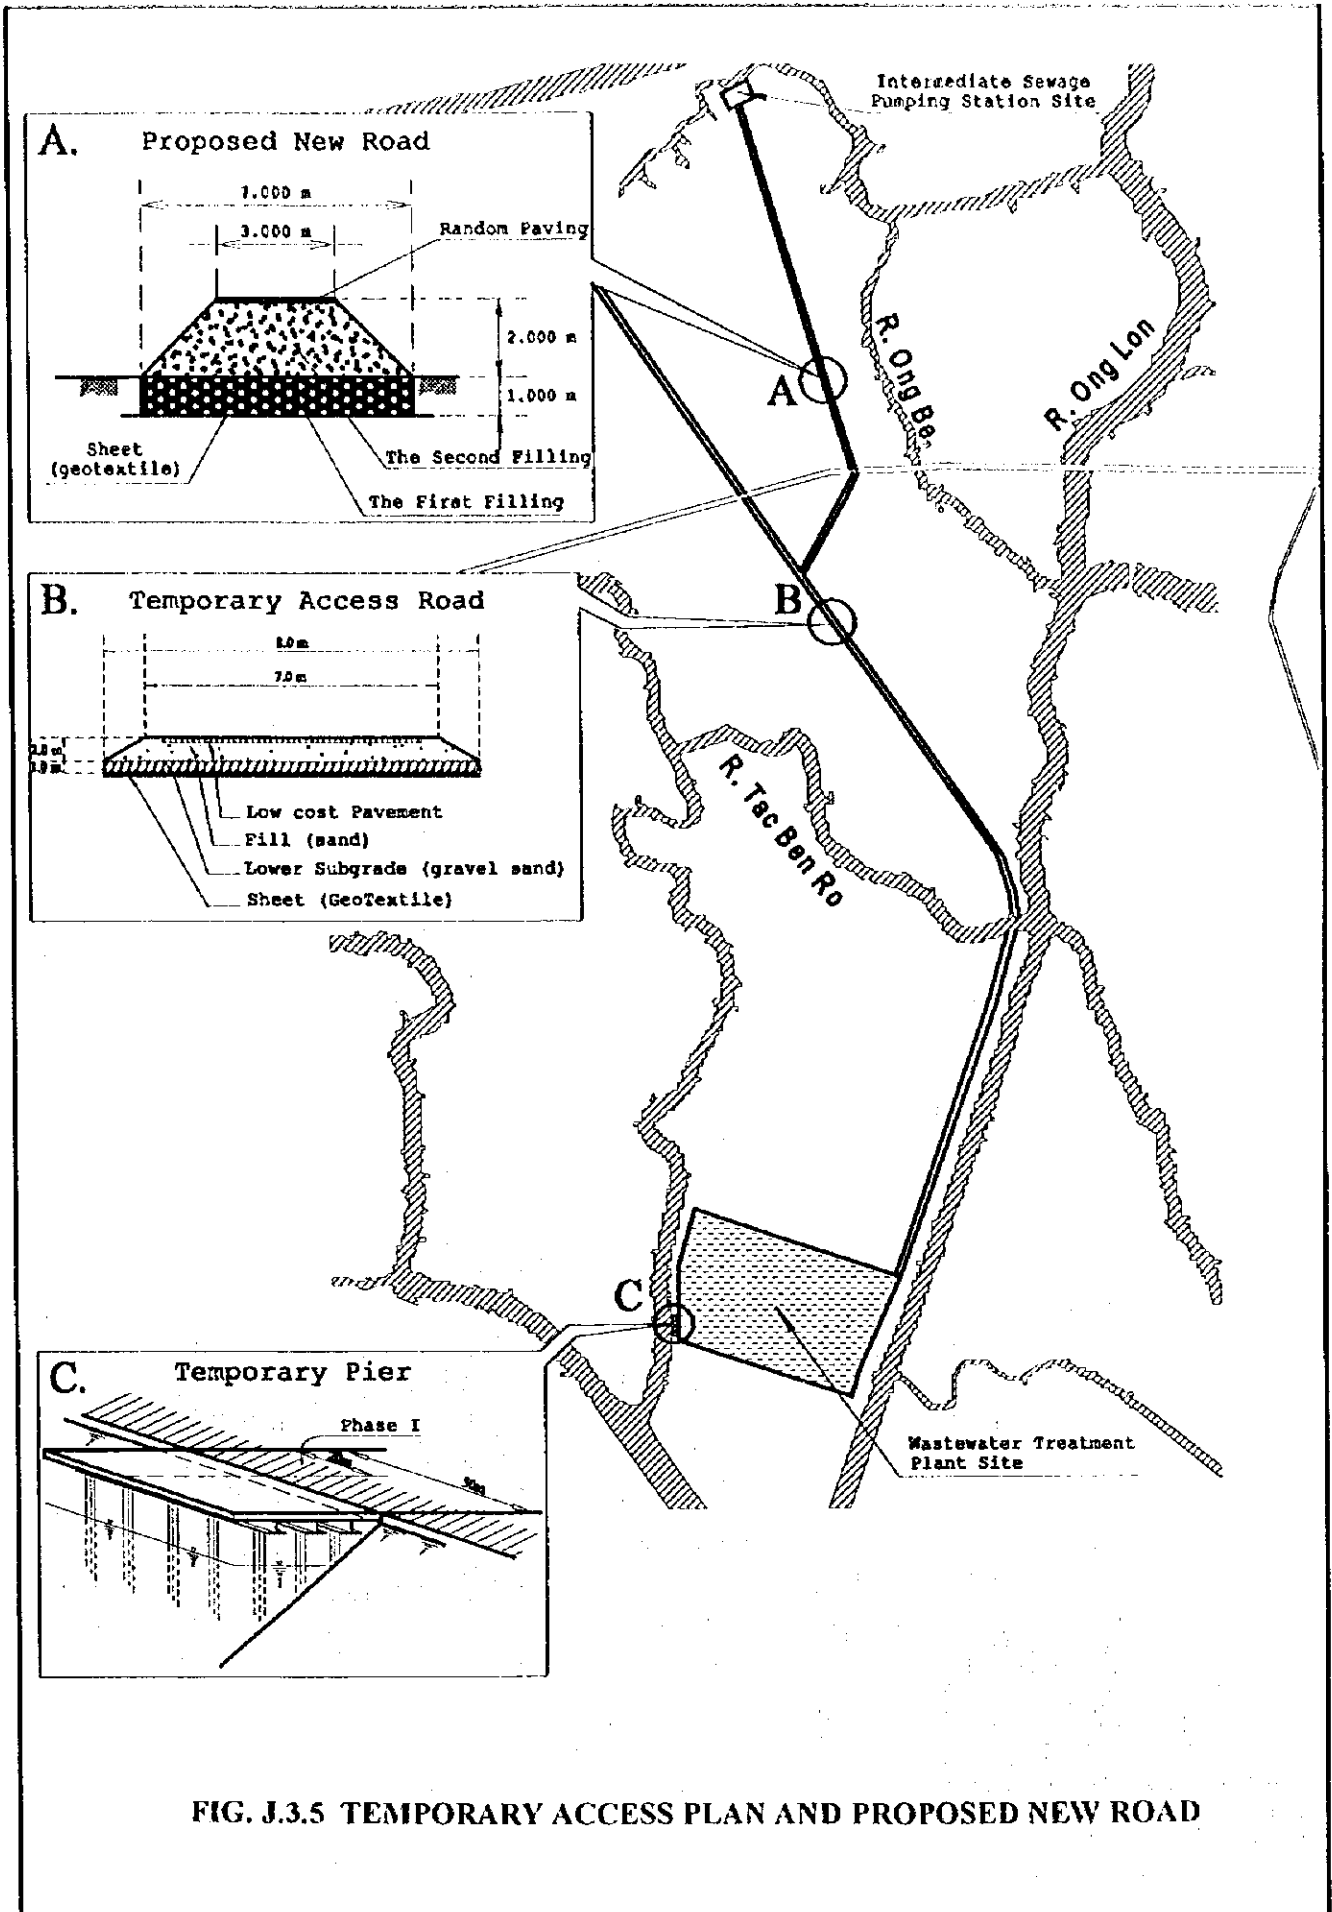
TEMPORARY ACCESS PLAN AND PROPOSED NEW ROAD
